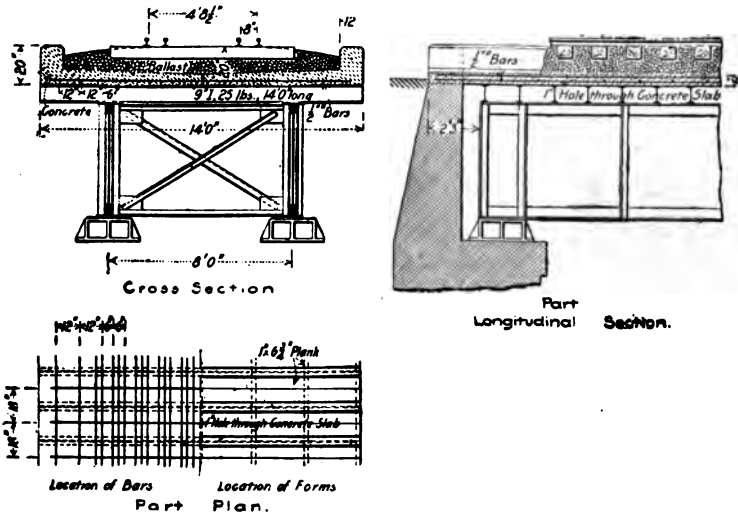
Floor for Deck Bridges, Wabash Ry.
